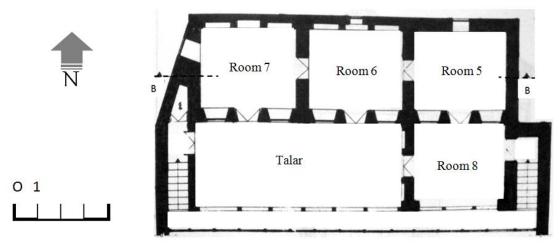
First-floor plan of a traditional building in Rasht (Memarian, 2006)
